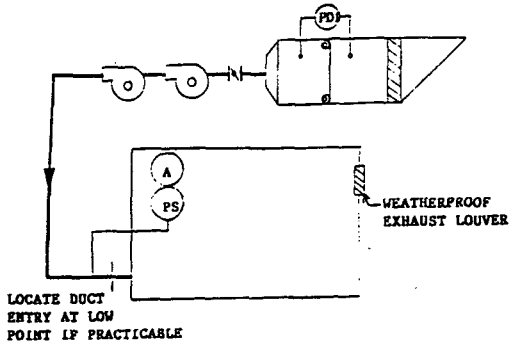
Typical Ventilation System for elec. room & Substations Containing liquid filled Transformers
